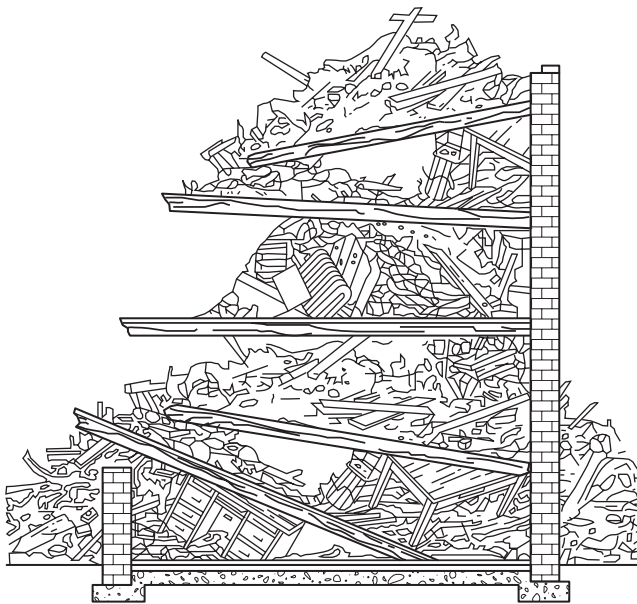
(d) Cantilever Floor Collapse. (Courtesy of U.S. Department of Civil Defense)
